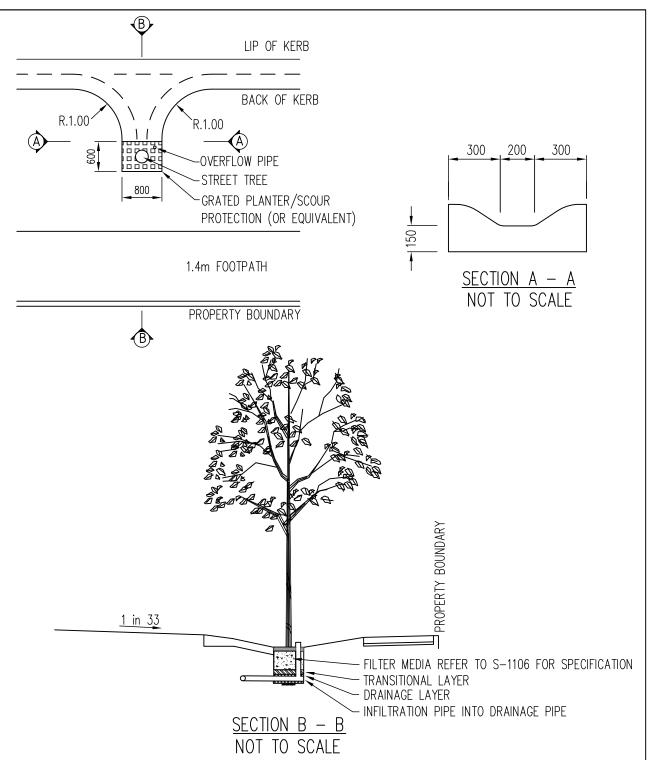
DETAILS OF SURCHAGE TO PIT TO SWALES AND BIORETENTION SYSTEMS
